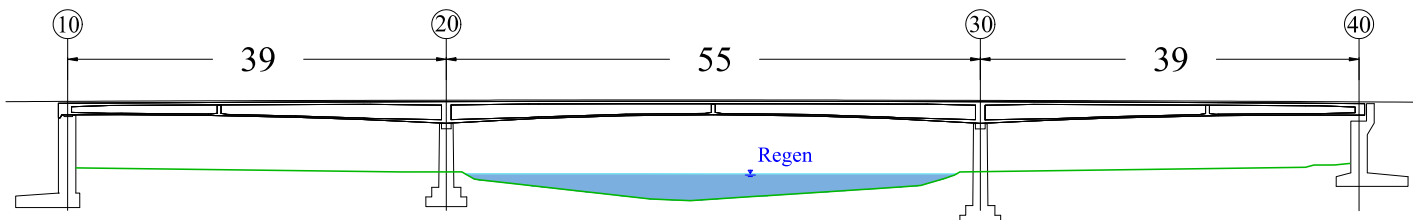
Longitudinal view of the investigated prestressed concrete bridge; span lengths specified in m (Küttenbaum *et al.*, 2019).
